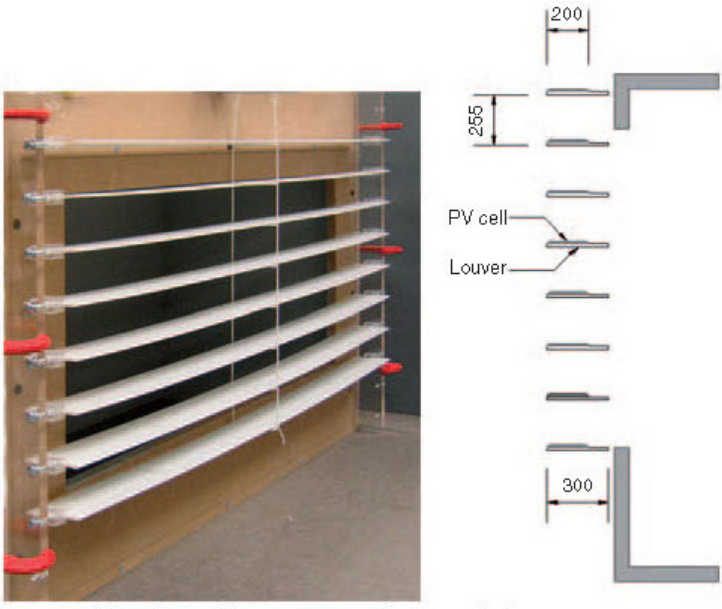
Eight slats of louver-type shading (Source – Kim, Jung, Choi, & Kim, 2010)
